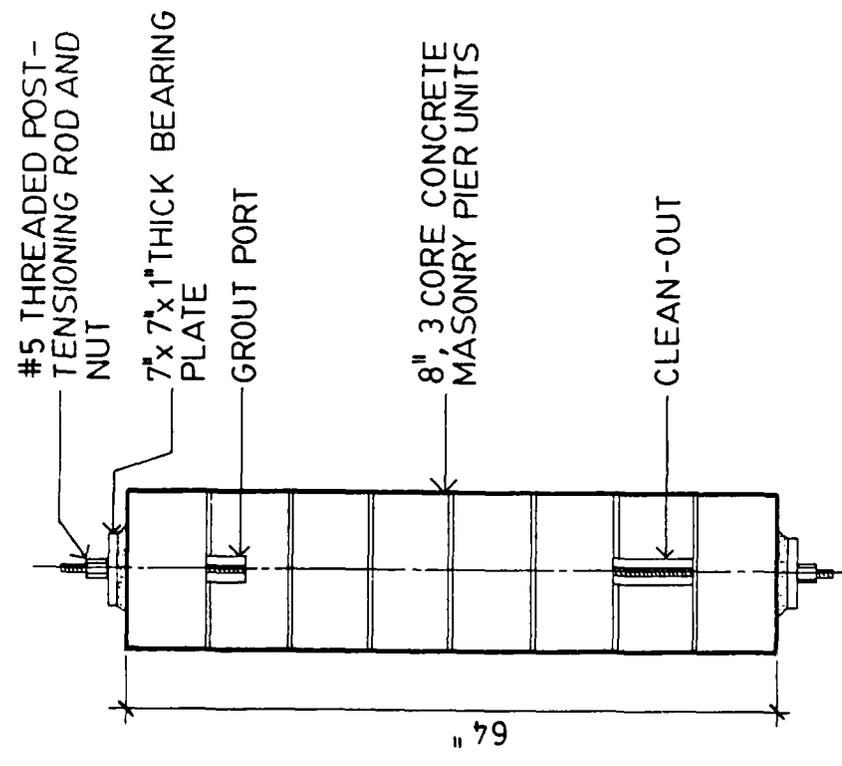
Typical Post-Tensioned Concrete Masonry Wall Panel.
